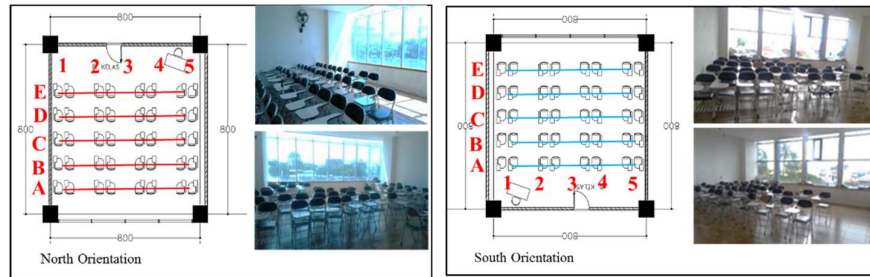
Classroom position and seat placement (Floors 2,3, and 4)
